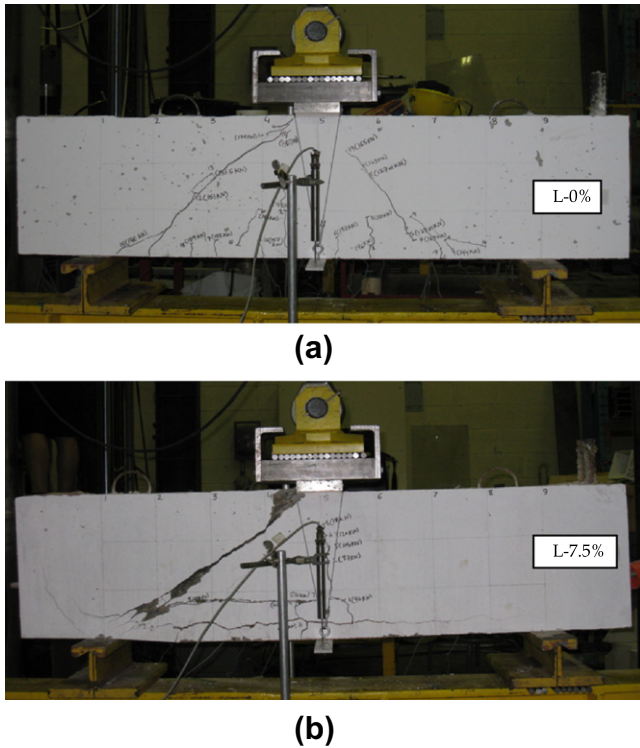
Series A (a) failure mode of control beam and (b) typical failure mode of corroded beam.
